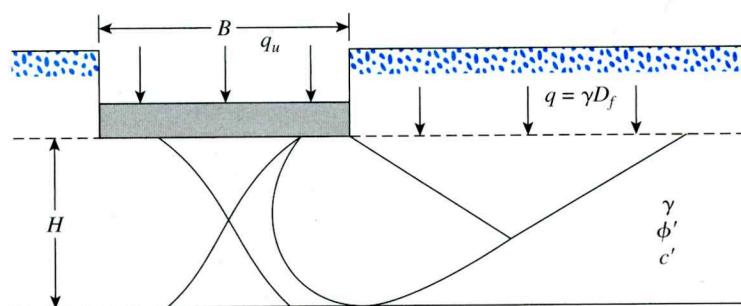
Failure surface under a rough, continuous foundation with a rigid, rough base located at a shallow depth
